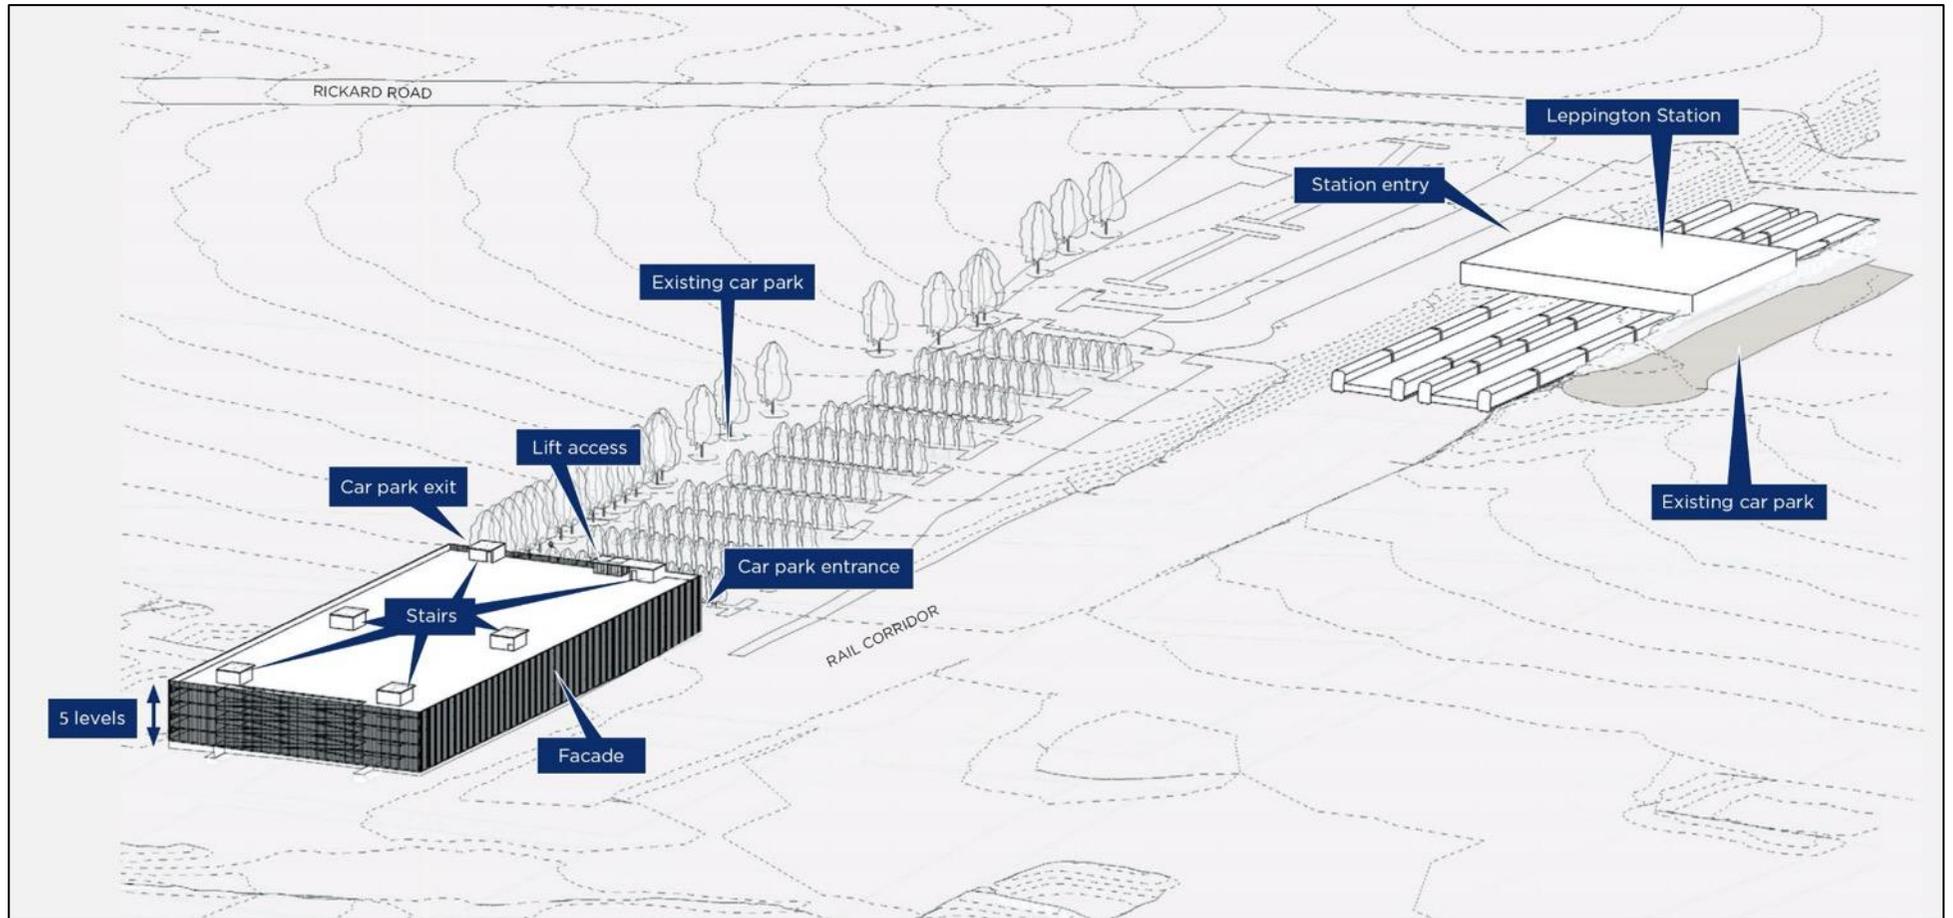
Overview of proposed commuter car park looking from the south west (subject to detailed design)
